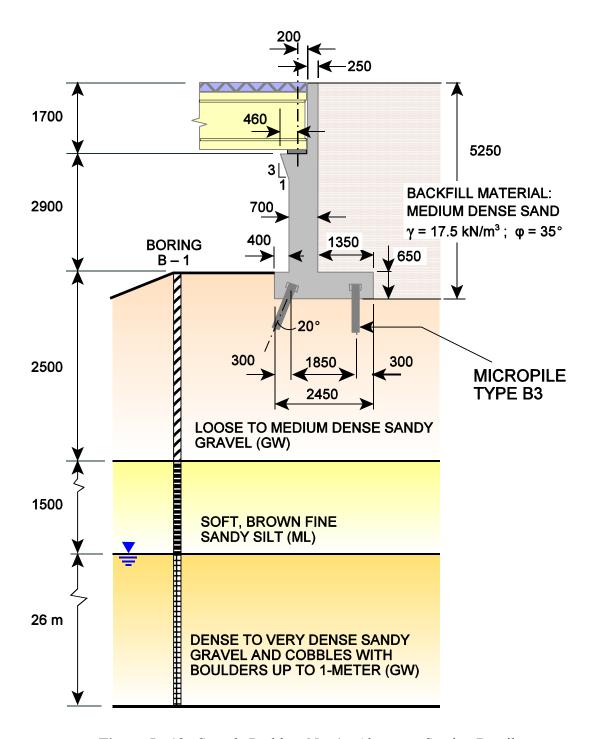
13. Sample Problem No. 1 - Abutment Section Detail.
